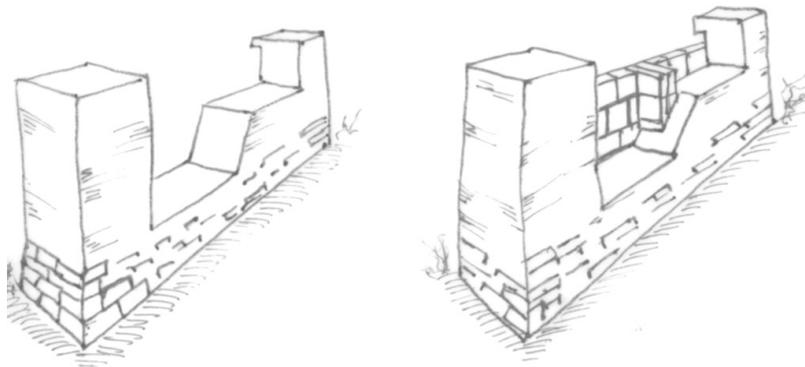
Dismantling and rebuilding collapsed sections in rammed earth or cob
